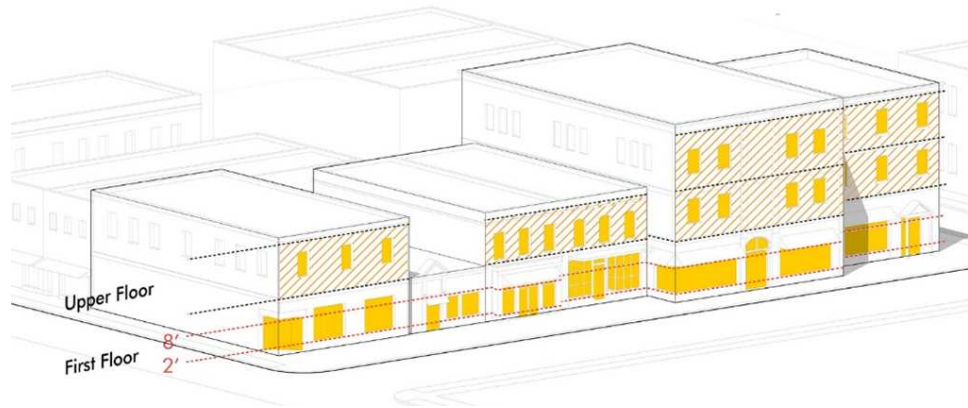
Windows and doors create a rhythm of architectural features that can make larger wall planes appear smaller and create relationships between the building and spaces around the building.
